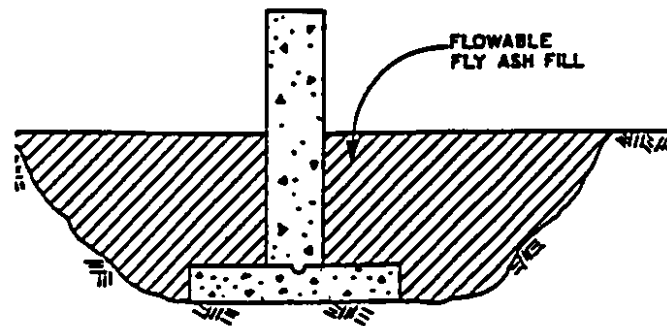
Flowable fill around concrete wall [Krell, 1989]
